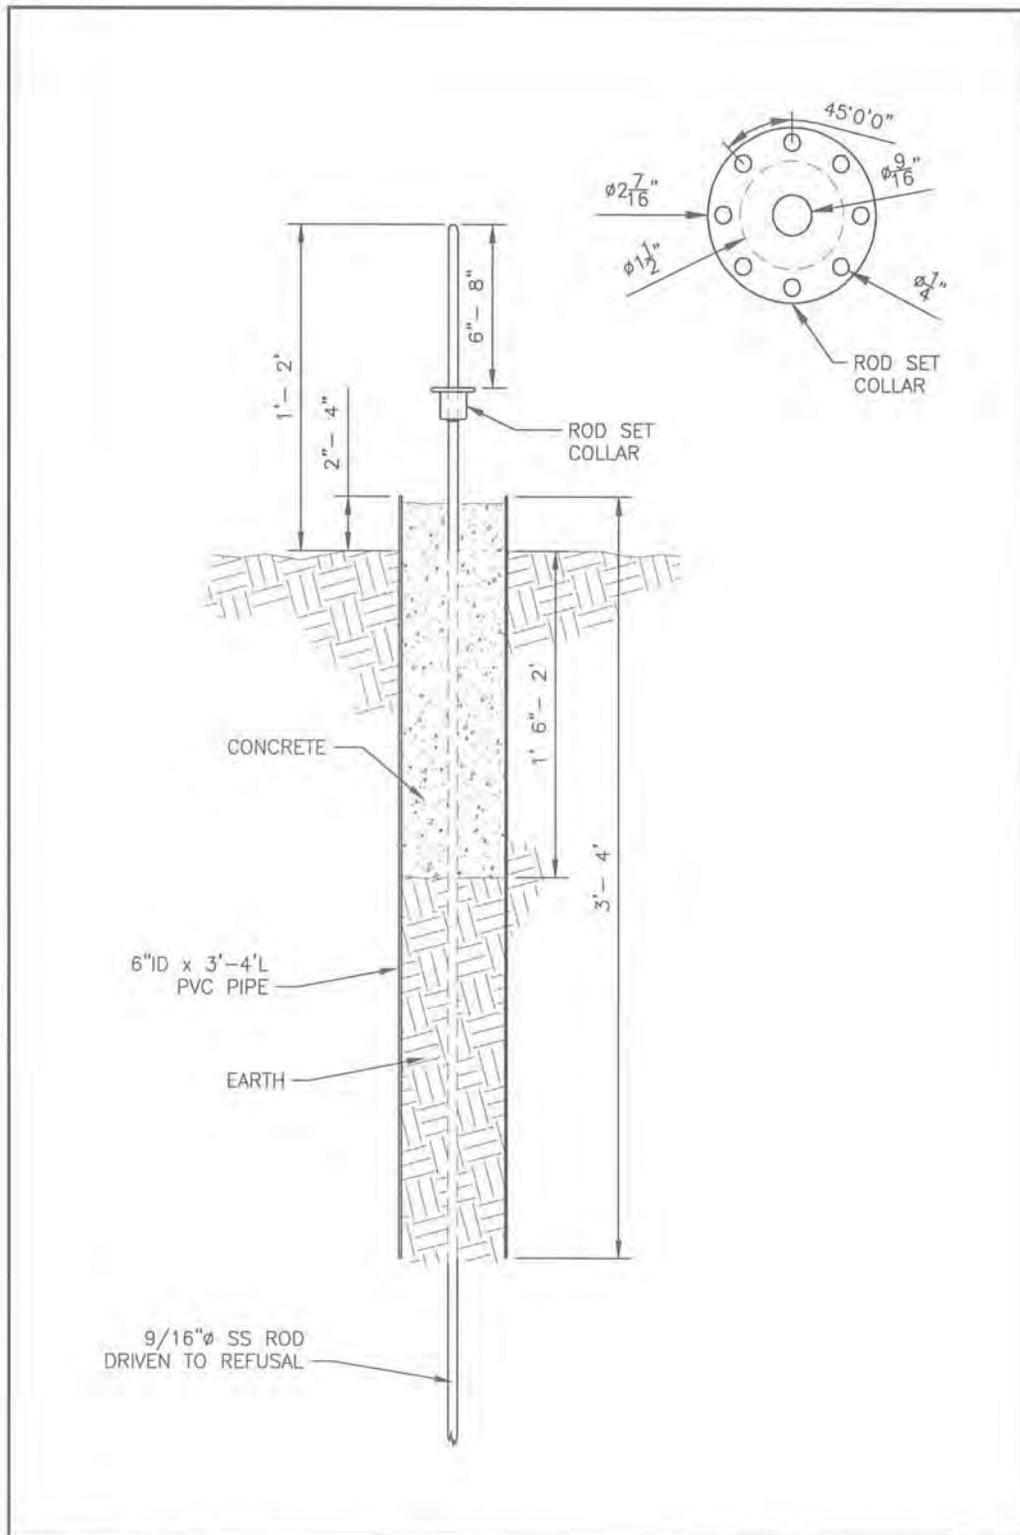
Detailed construction drawing of a typical RSET station with collar. Inset: Collar detail.
